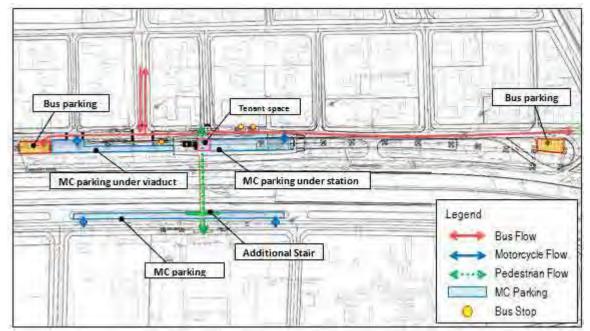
Concept Plan of the Thu Duc Station Area (upon UMRT opening)
